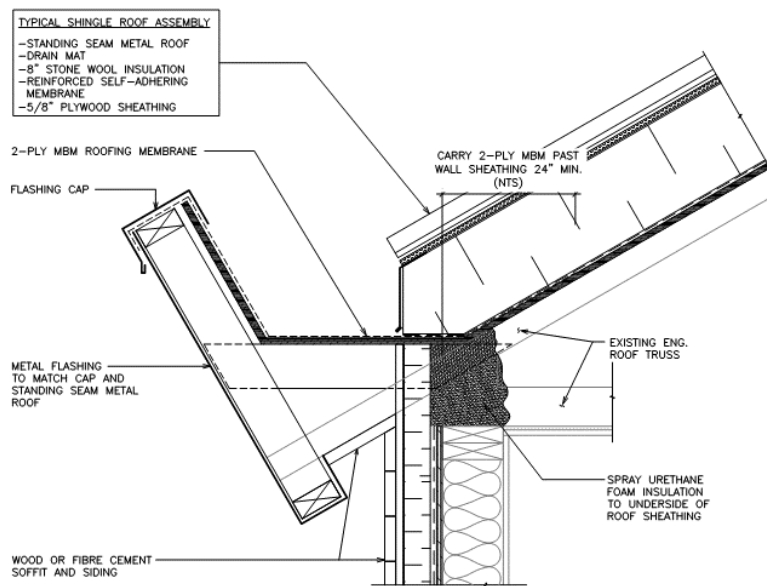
ABOVE CODE ROOF CROSS SECTION [11]
